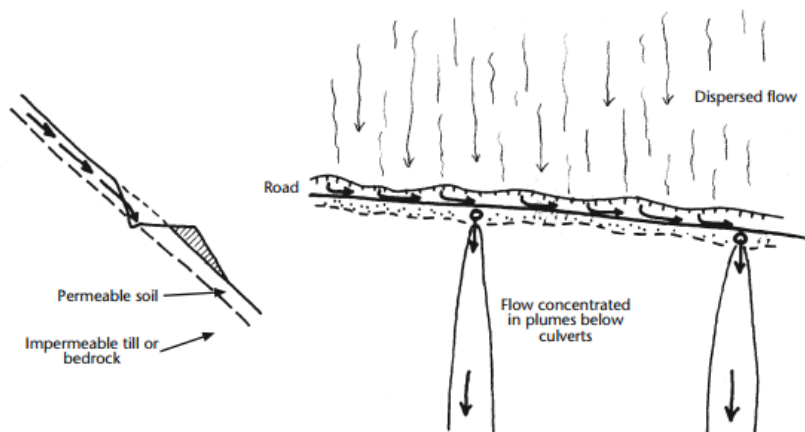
Sketch showing the typical effect of roads and culverts on slope hydrology, for uniform slopes with shallow soils and low drainage density.
